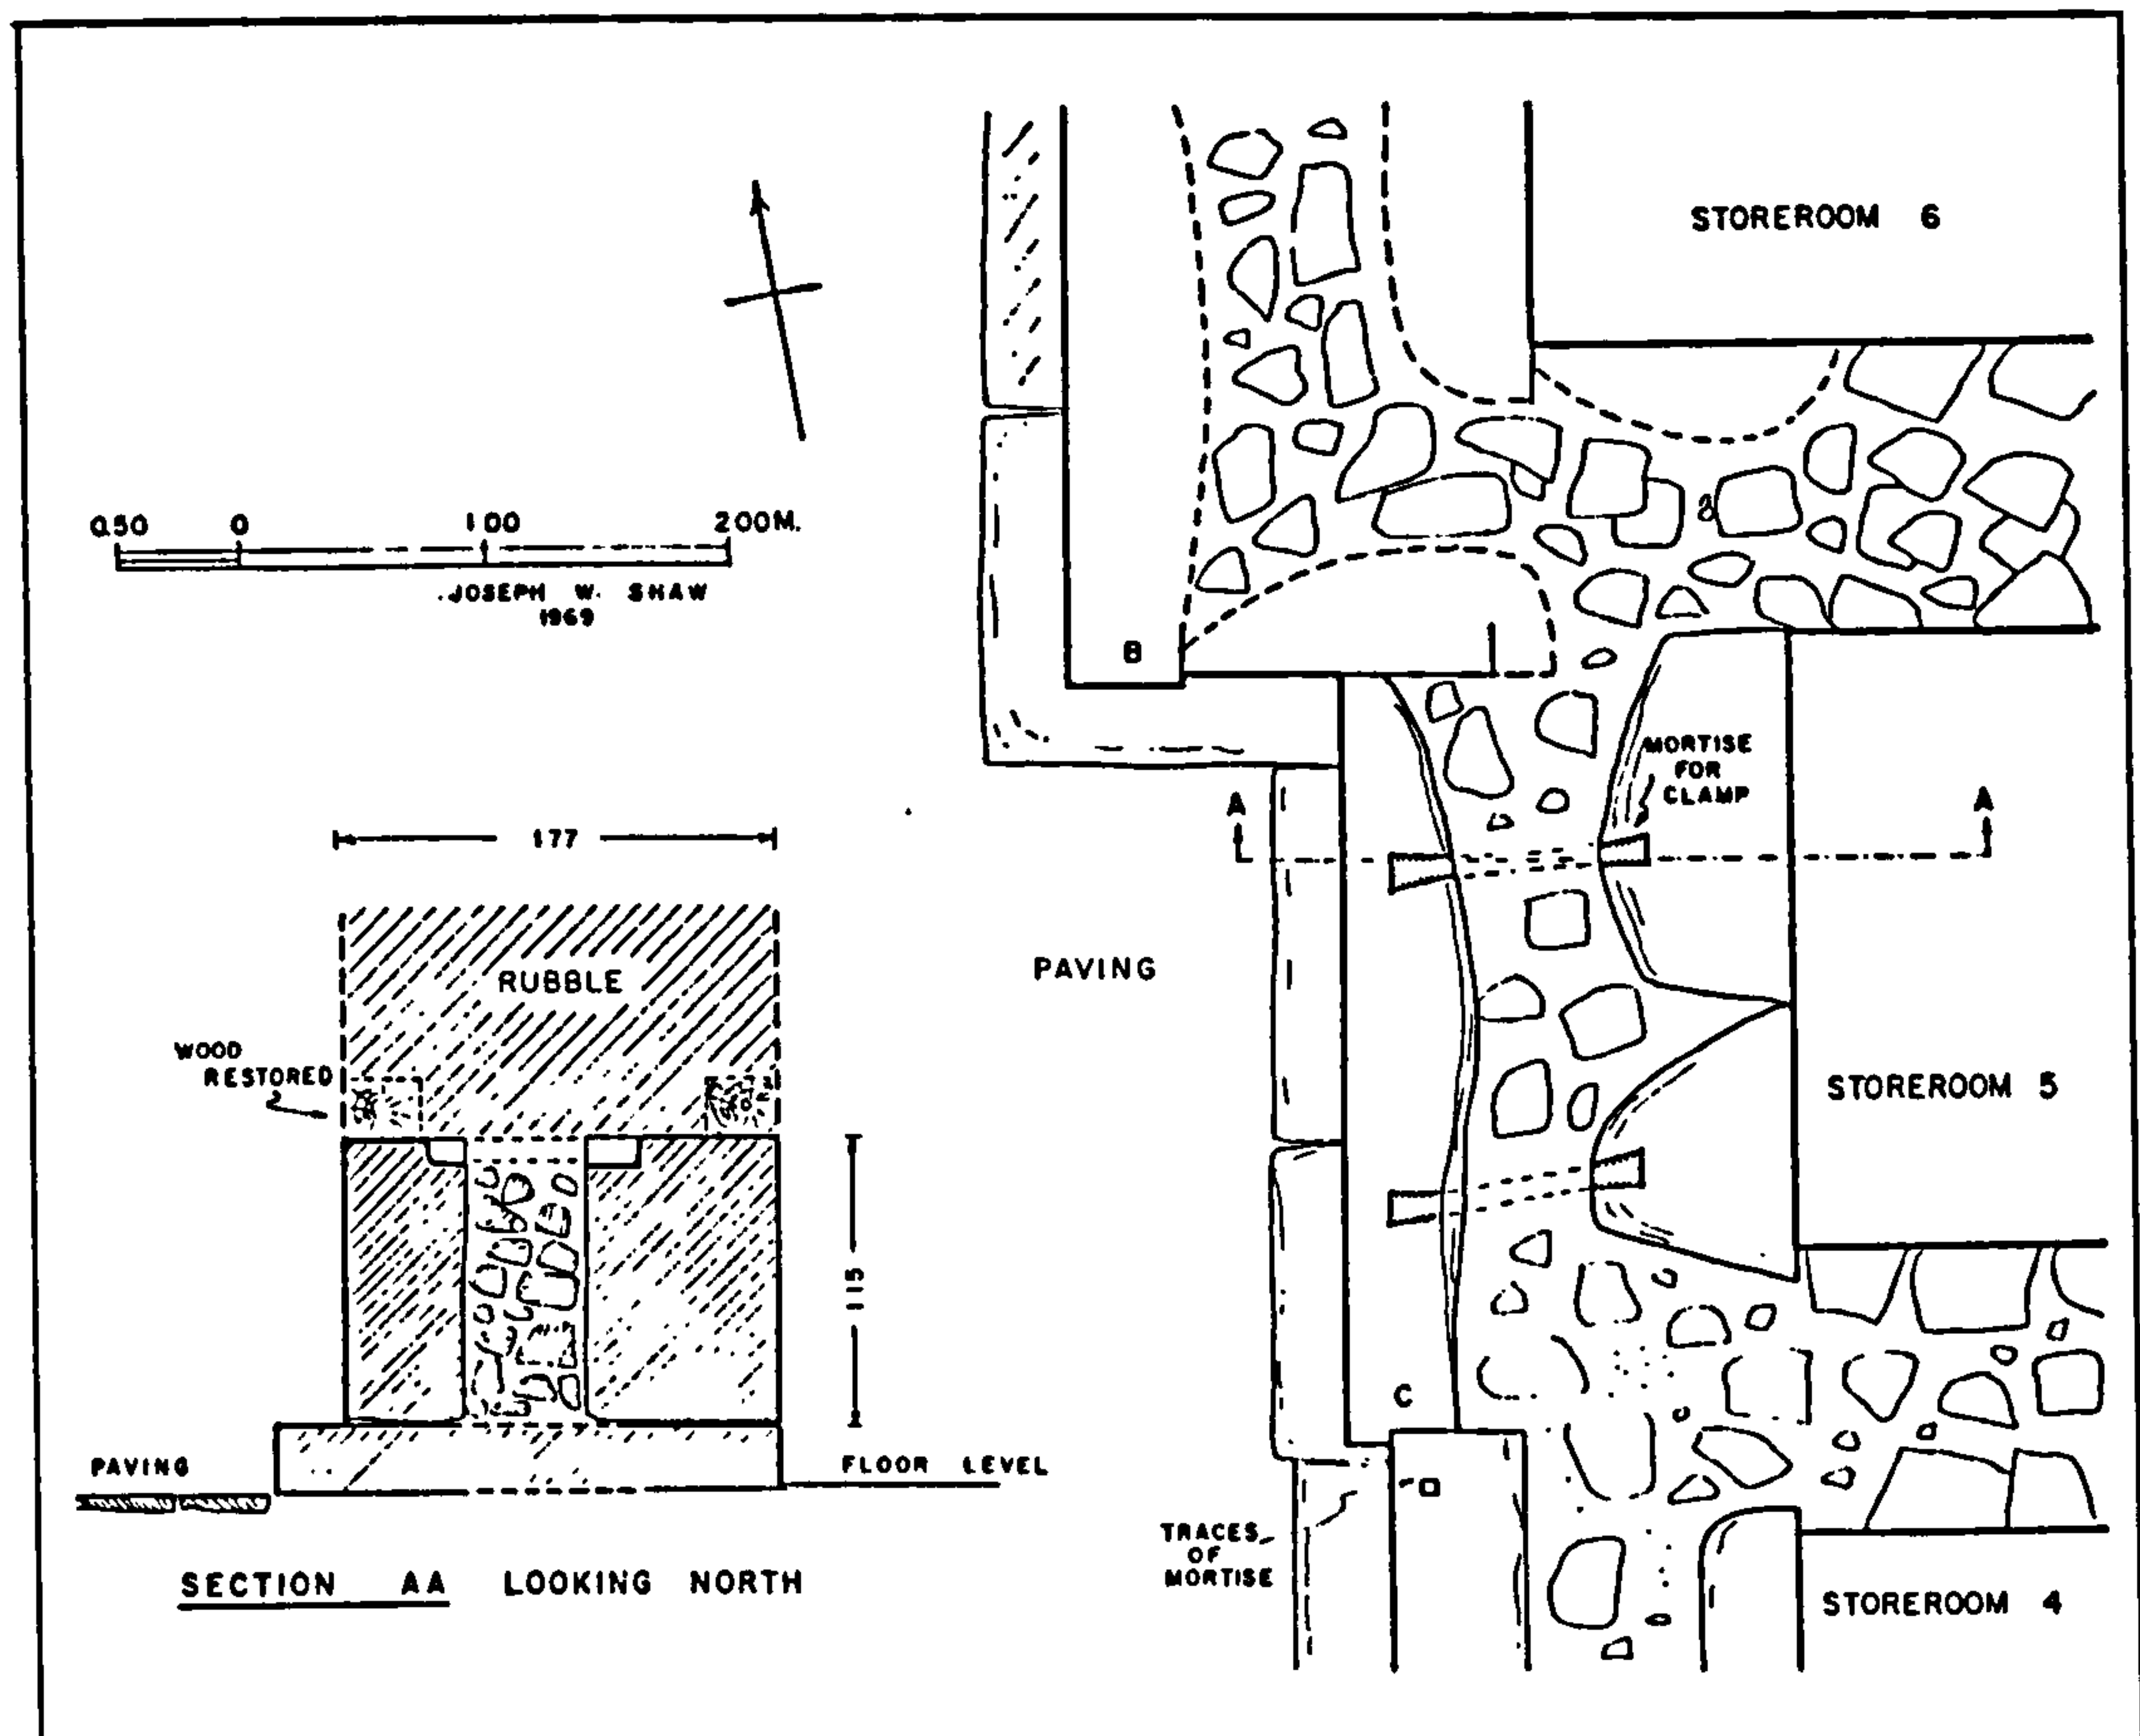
Plan and section of the West Wall showing the wedge shaped blocks and the mortises for the wooden clamps. Drawing by J. Shaw.
